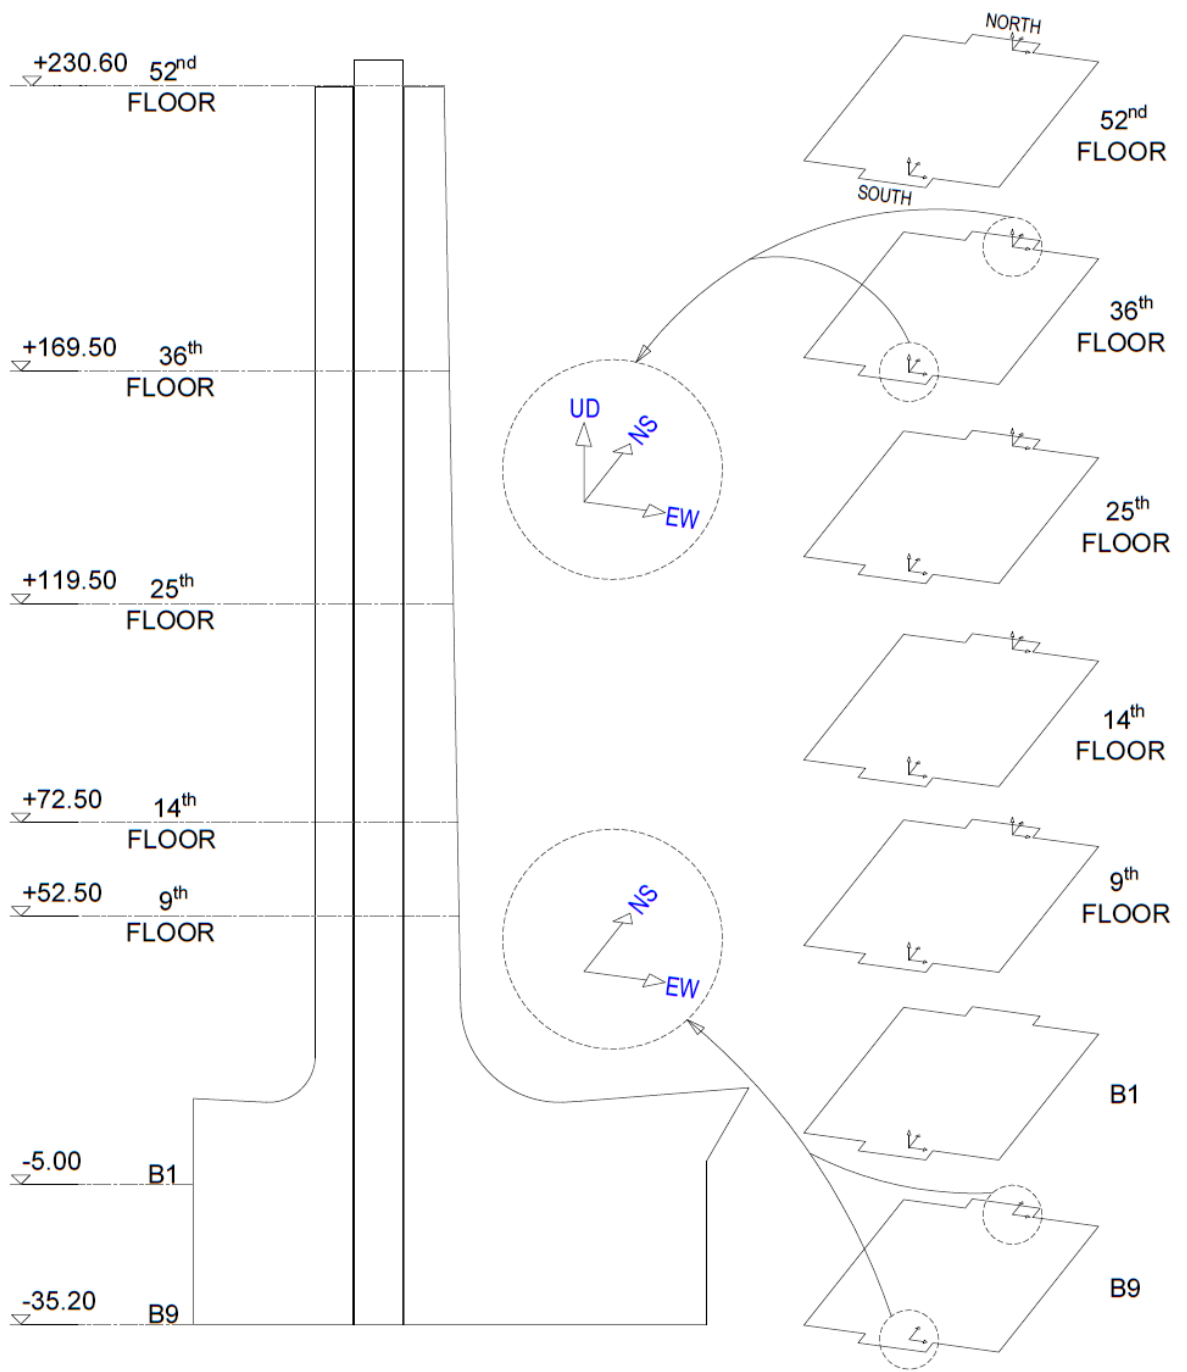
Instrument layout in the vertical section for the Sapphire Building (37 channels).
